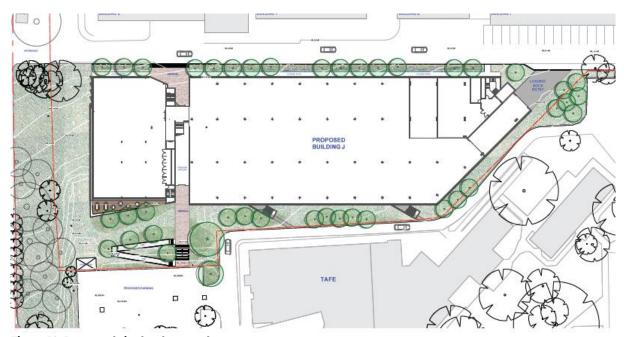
Proposed site landscape plan Source: ASPECT Studios
